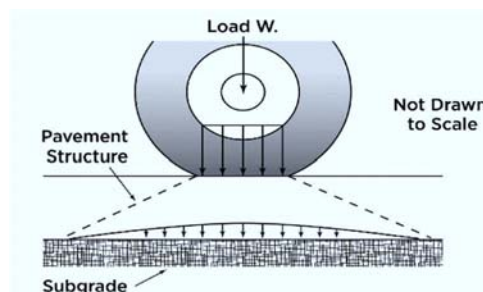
Load Transfer in Flexible Pavement (TAC, 2013)
